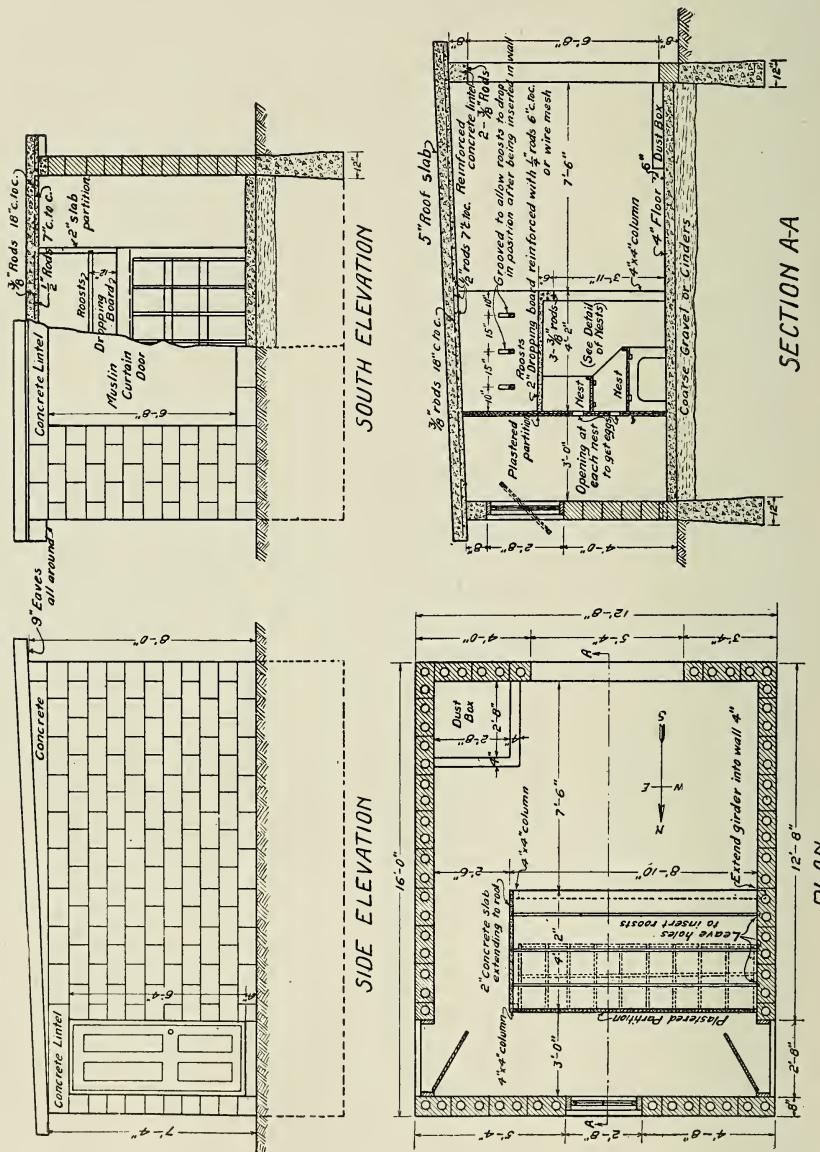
Concrete Block Poultry House which may be enlarged to accommodate additional flocks by duplicating the structure as shown.
